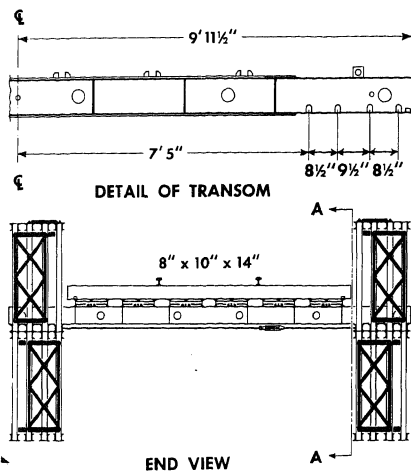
Quadruple-truss double-story through-type panel railway bridge.
